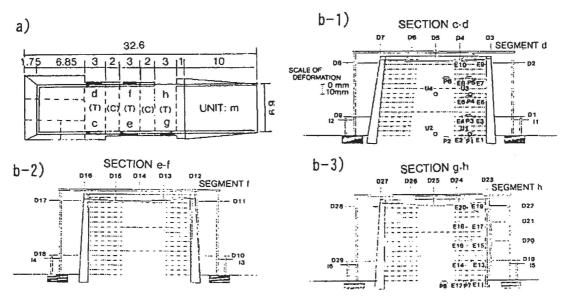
a) Plan; and b) initial cross-sections (gabions at the wall face are not shown) of JR test embankment No. 1.
